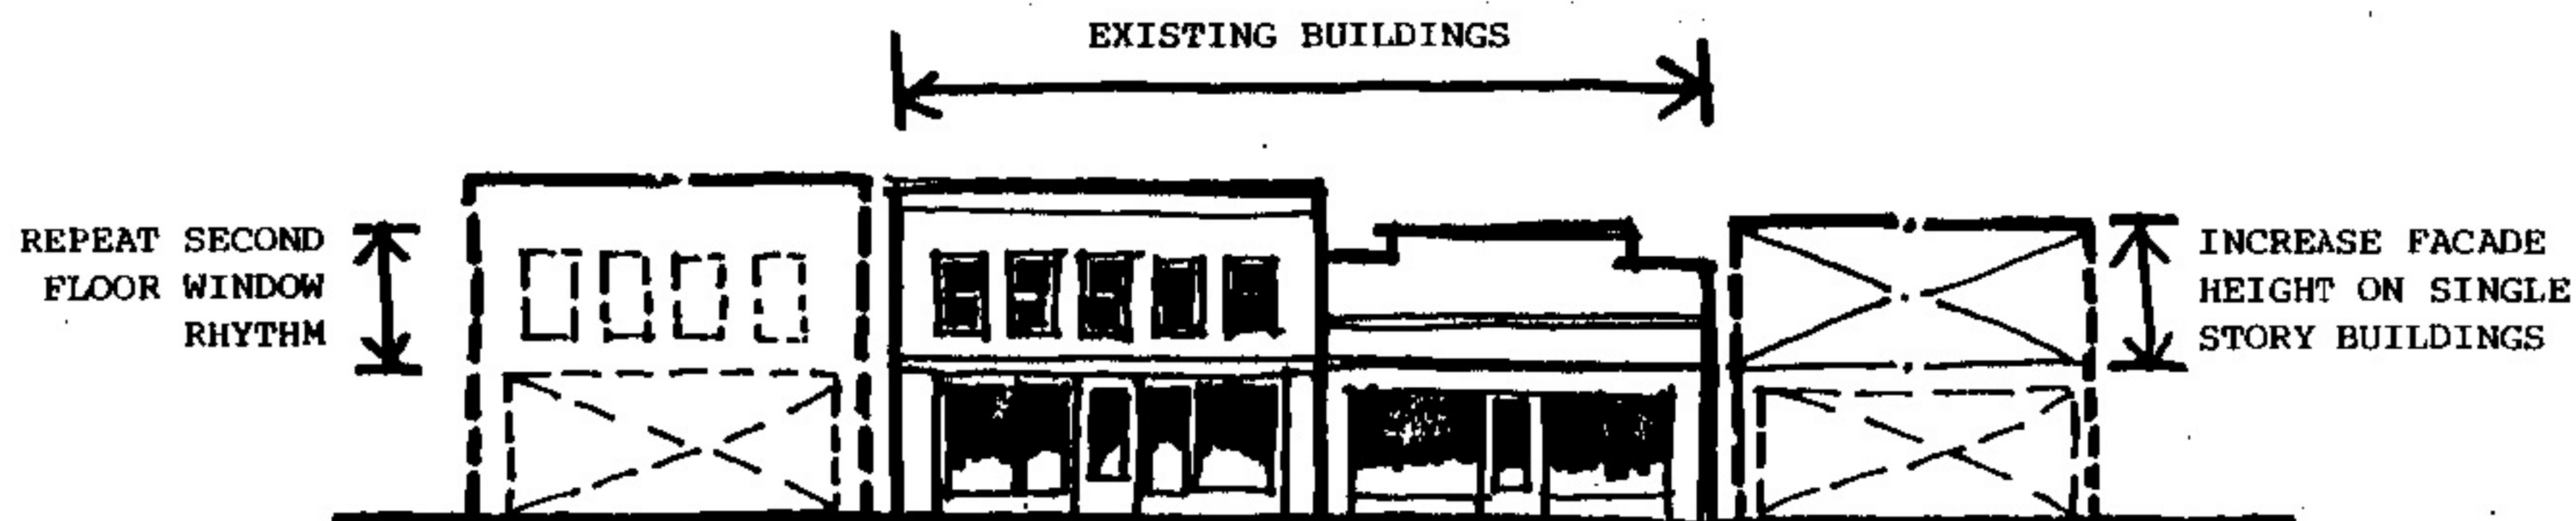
New construction should attempt to blend with the height, scale, and rhythm of existing buildings.
